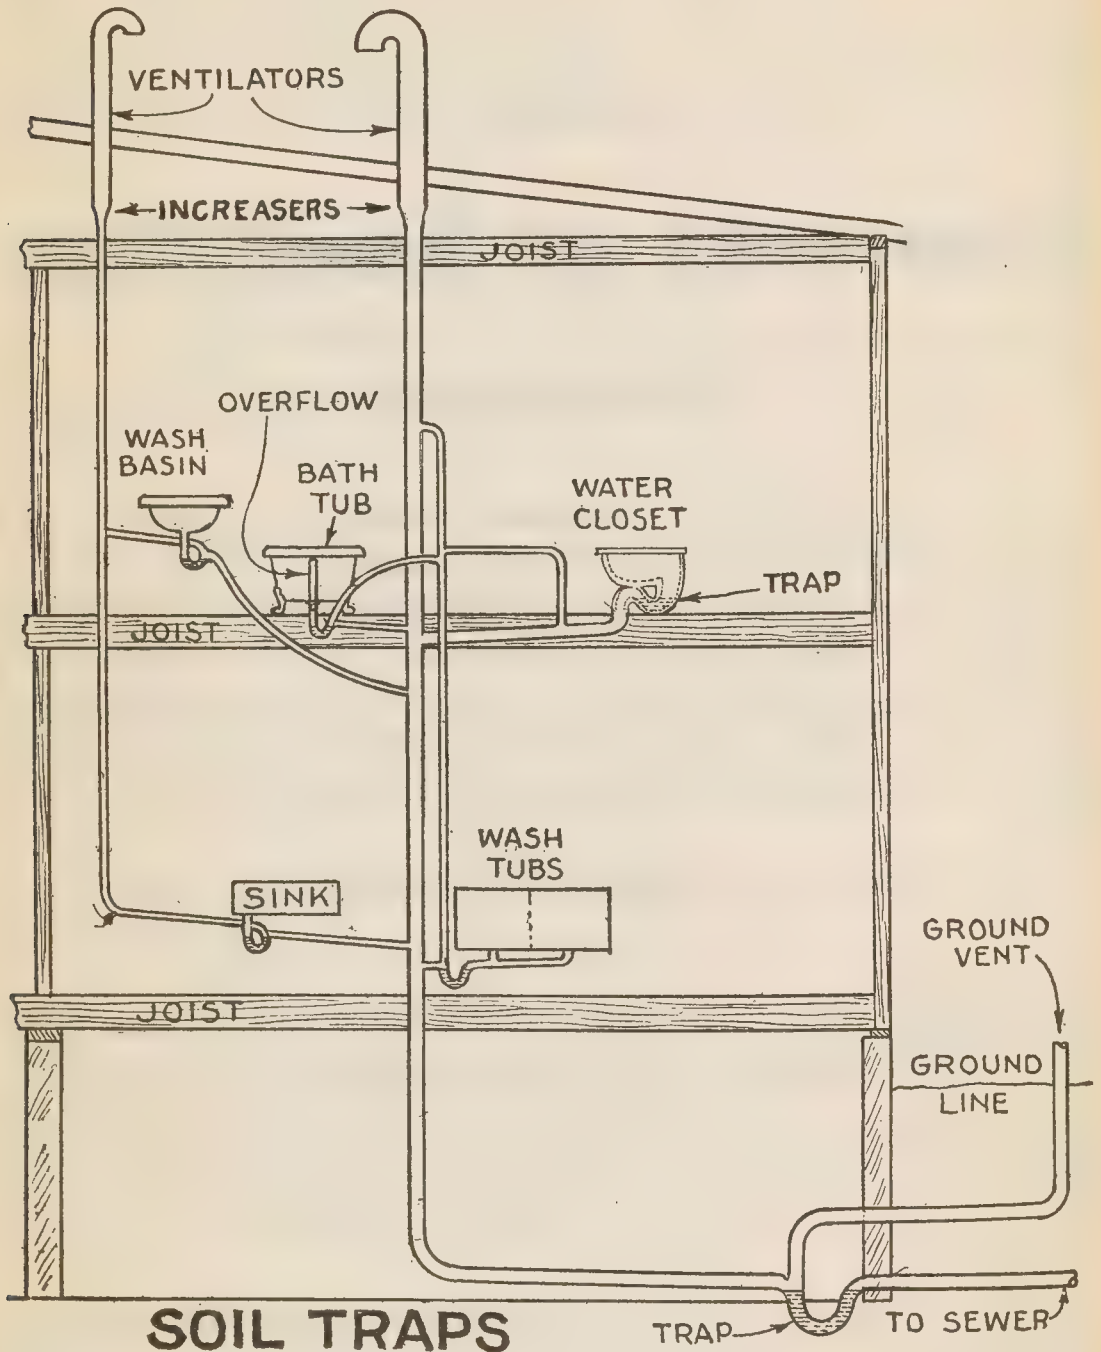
,647.—Typical drainage system showing essential features in the arrangement of the piping and location of traps.
